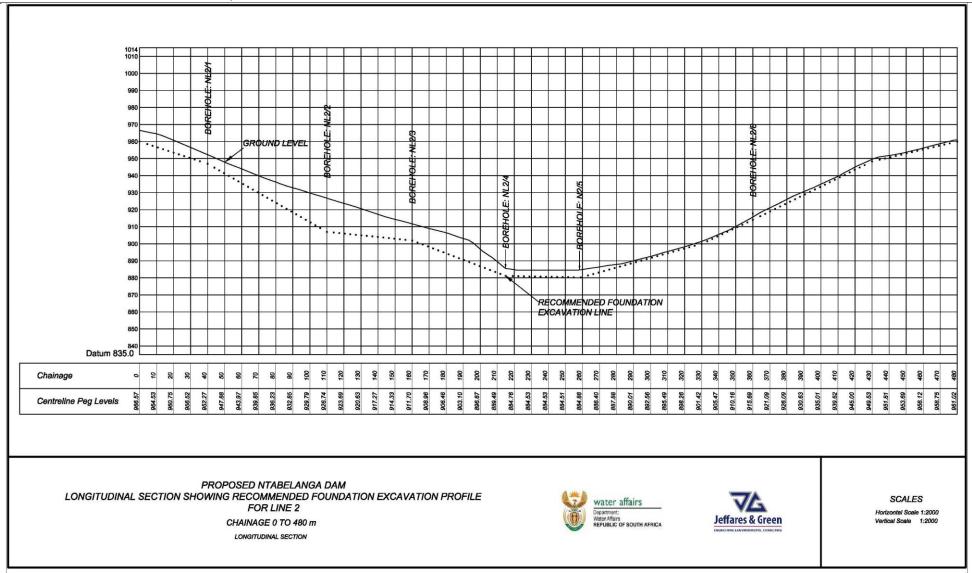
LS - Recommended Foundation Excavation Profile for Line 2
